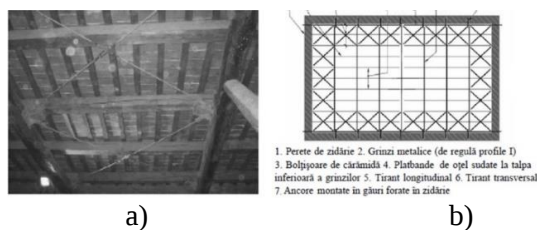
Reinforcement of floors: a) made of wood with metal tie rods (braces in "X"); b) of metal profiles and brick vaults with metal tie rods ("X" braces) [6]
